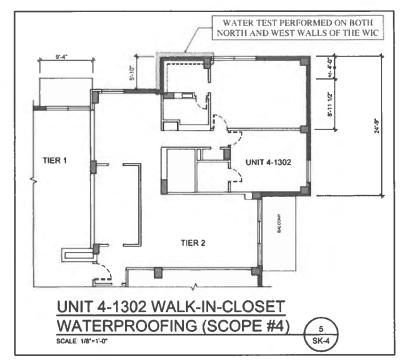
Plan View of Unit 1302 Highlighting the Water Test Area
